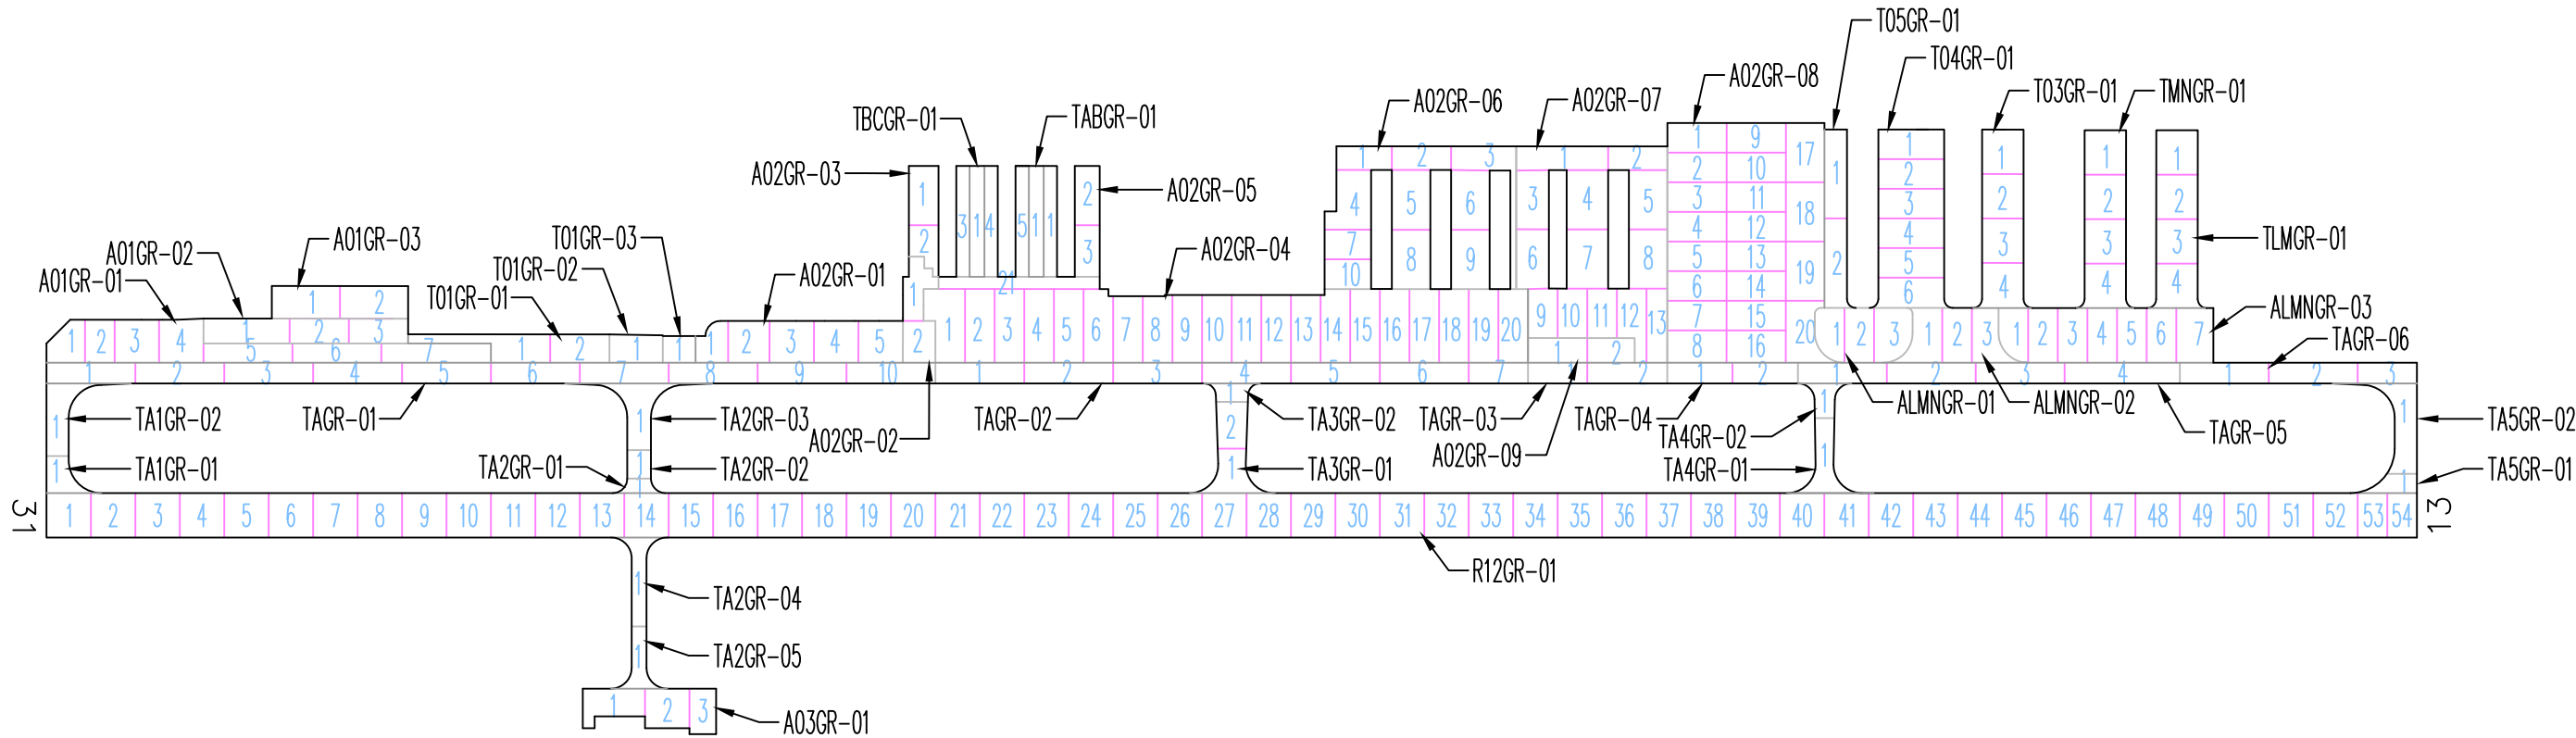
Pavement Branch, Section and Sample Unit Layout.
